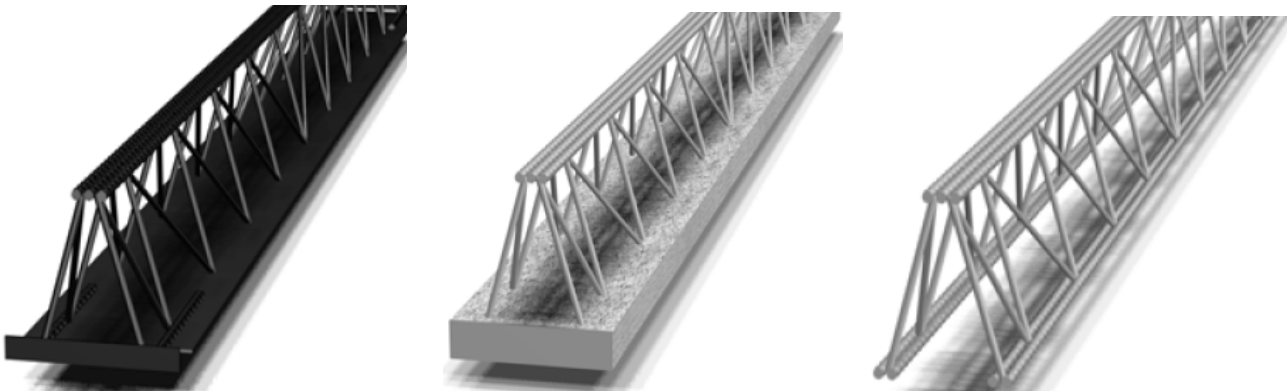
(left) Beam with bottom steel plate; (centre) beam with concrete bottom chord; (right) Beam with bottom chord made only by steel bars.
